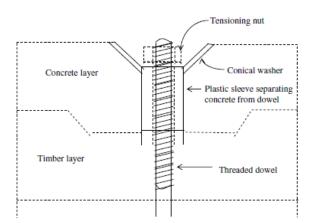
Notched shear key/anchor connection (Gutkowski, Brown, Shigidi, & Natterer, 2008).
